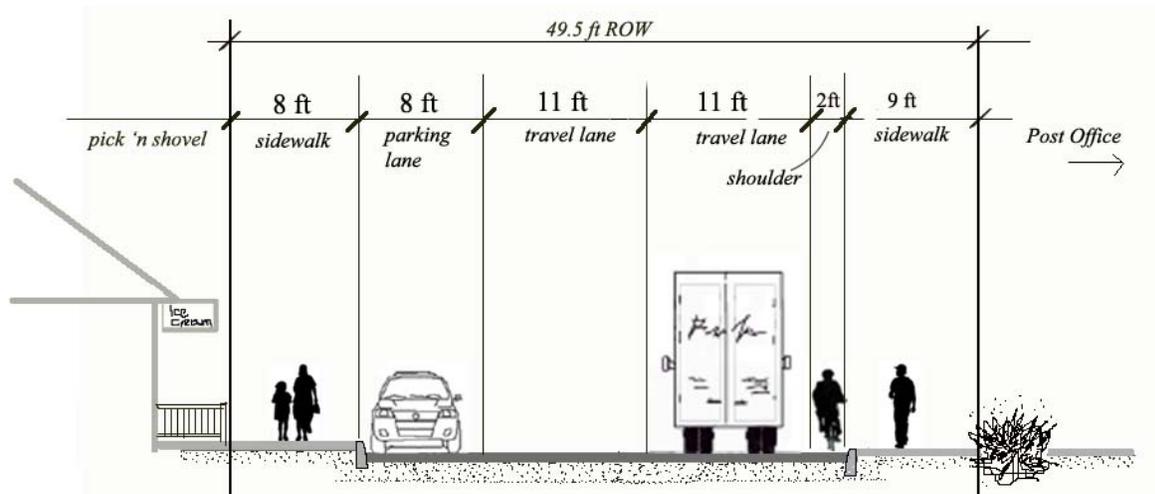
CROSS SECTION IN CURRENT ENGINEERING PLANS OF COVENTRY STREET
